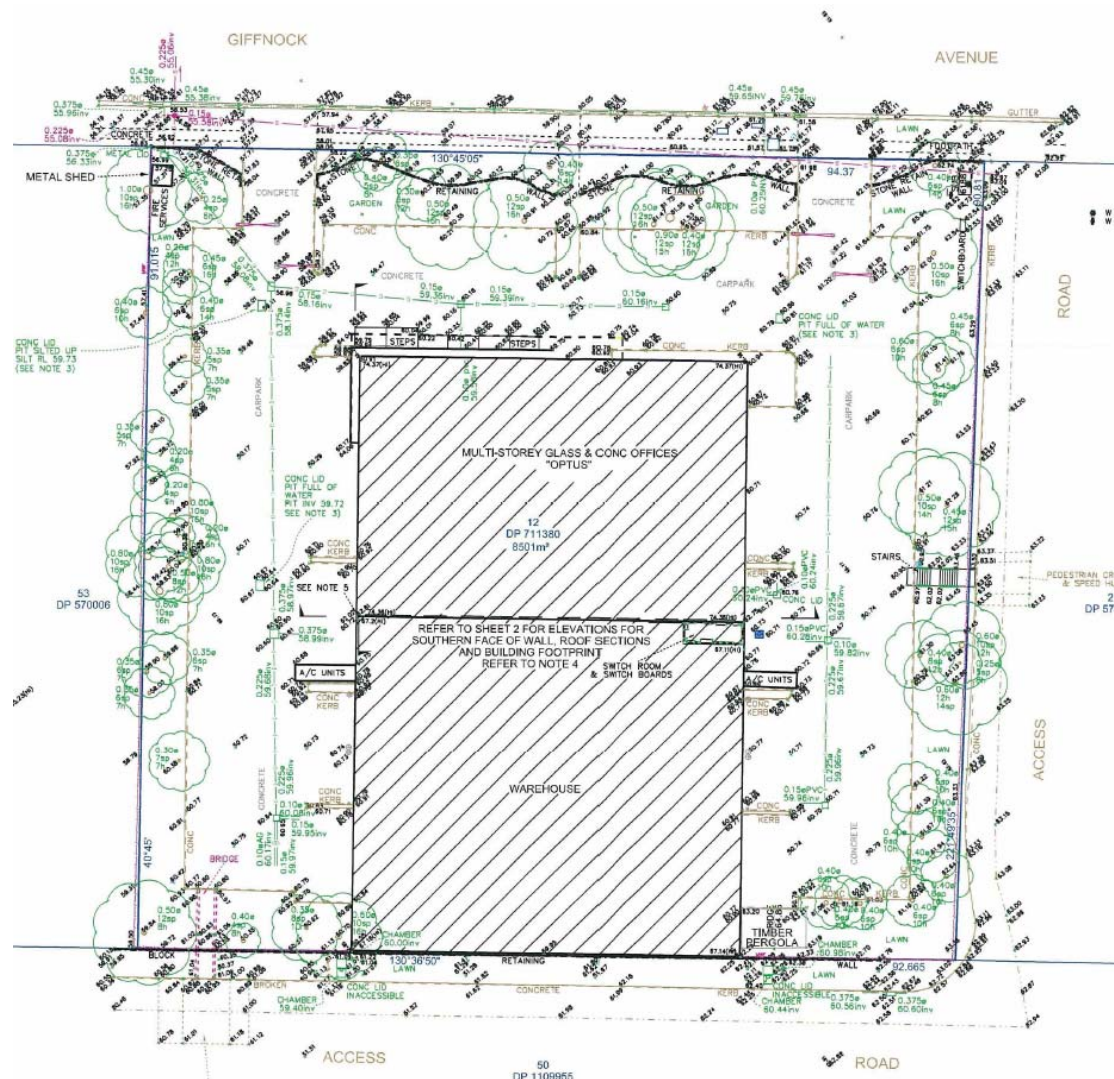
The above plan demonstrates the existing buildings, on site car parking and trees on the subject site.
